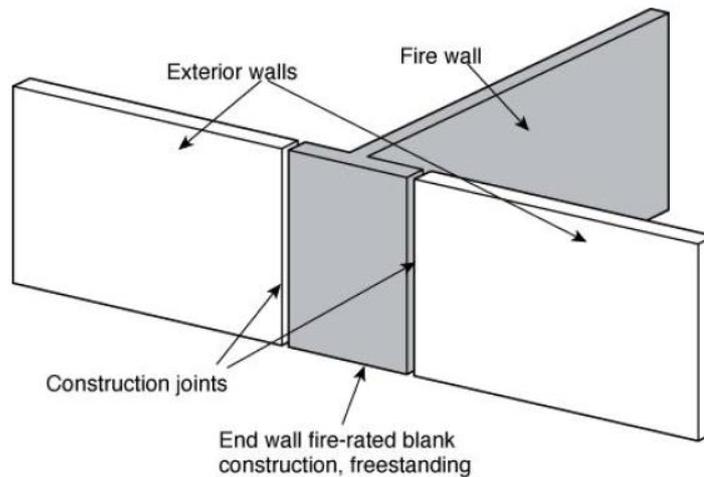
(b) End Wall Exposure Protection — End Walls Not Tied to Structural Framing.
